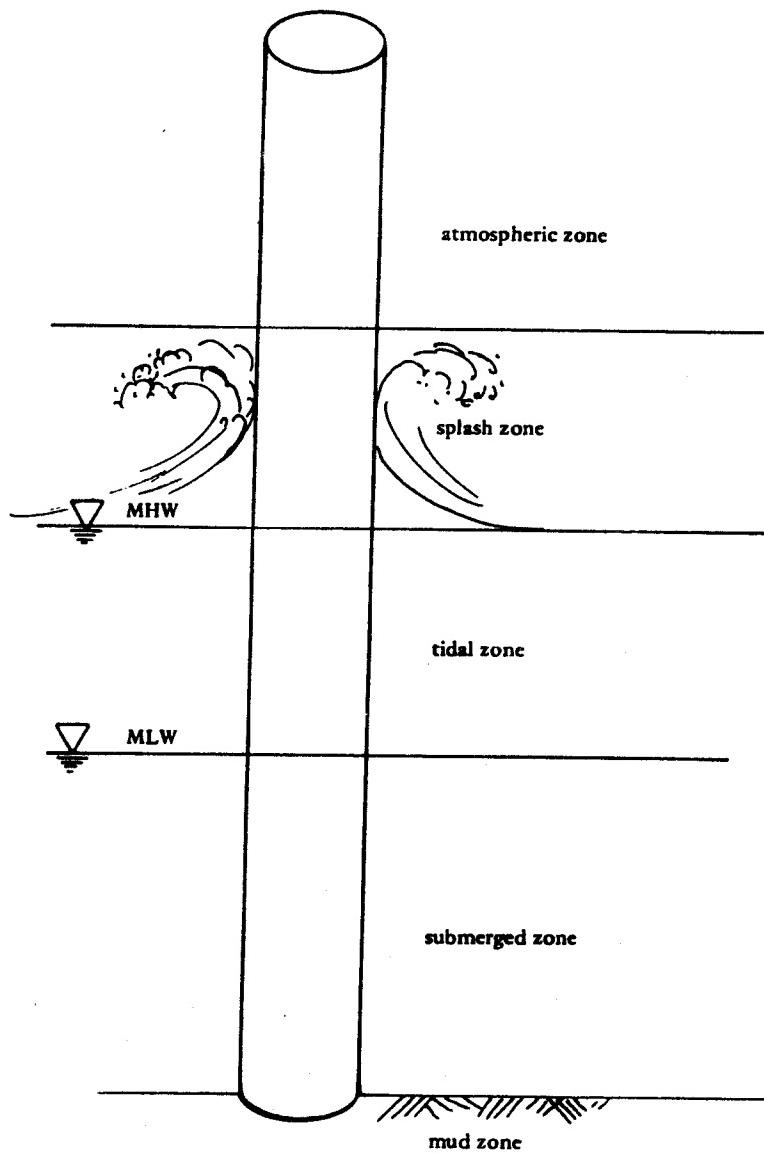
Exposure zones (from Brackett, Nordell, and Rail 1982)
